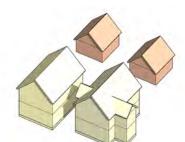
Basic massing, articulation, and opening strategies should relate to each other and break down the scale of the building.
